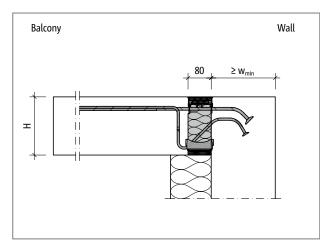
Schöck Isokorb® T type K-O: Wall connection downwards with external insulation
